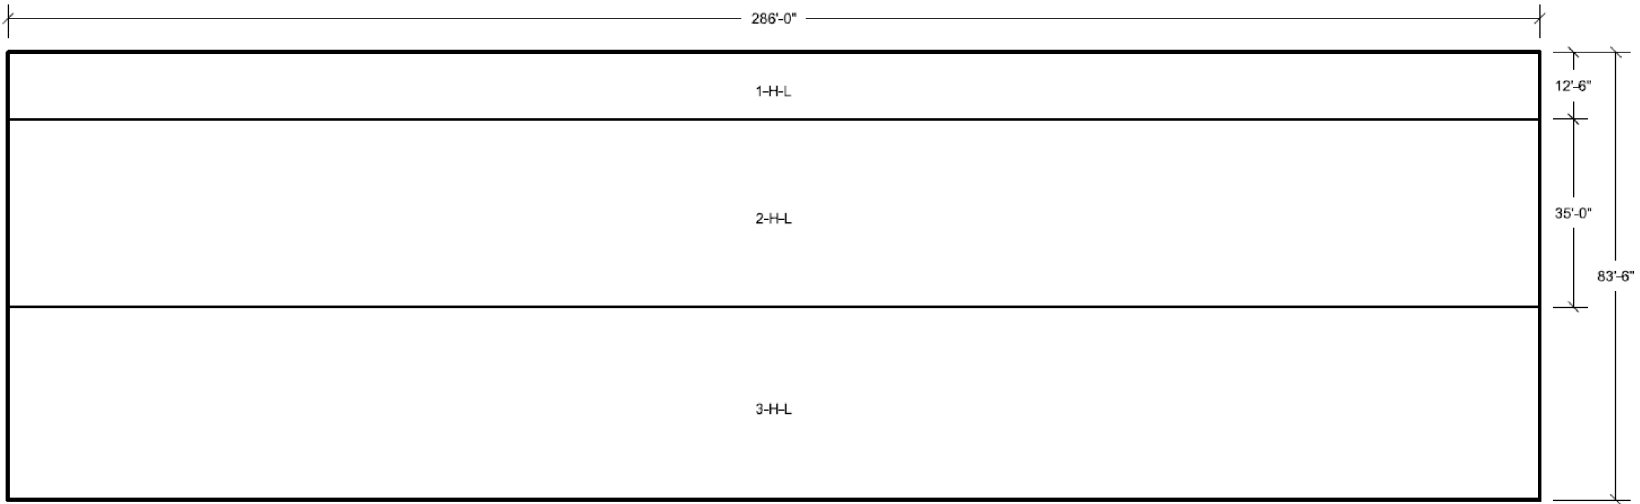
H.6-87 UHS Basin South Wall Looking North Horizontal Reinforcement Zones Near Side Face
